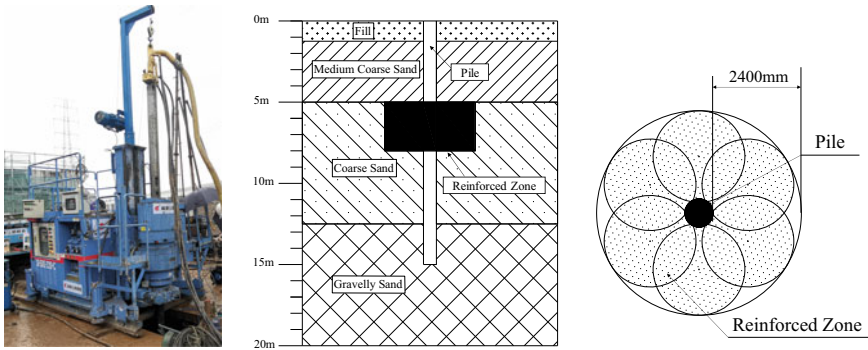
MJS machinery and scheme of pile side grouting reinforcement
